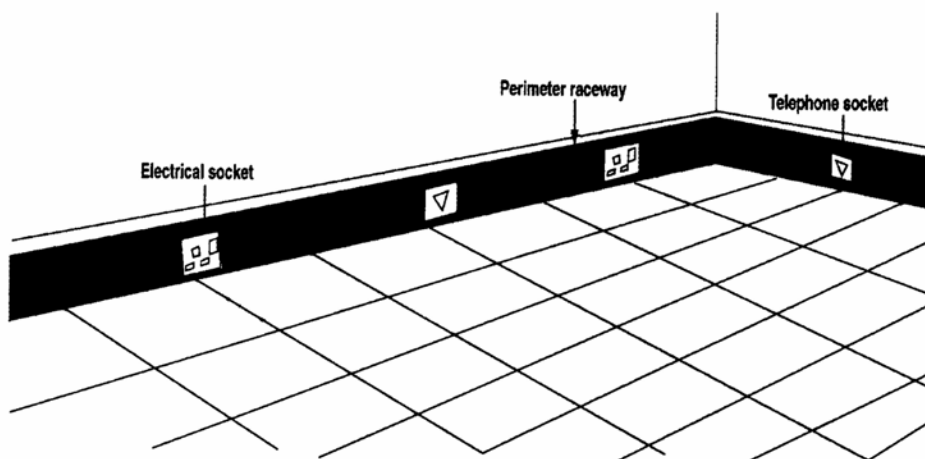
PERIMETER RACEWAYS RECESSED INTO BASE OF WALL
